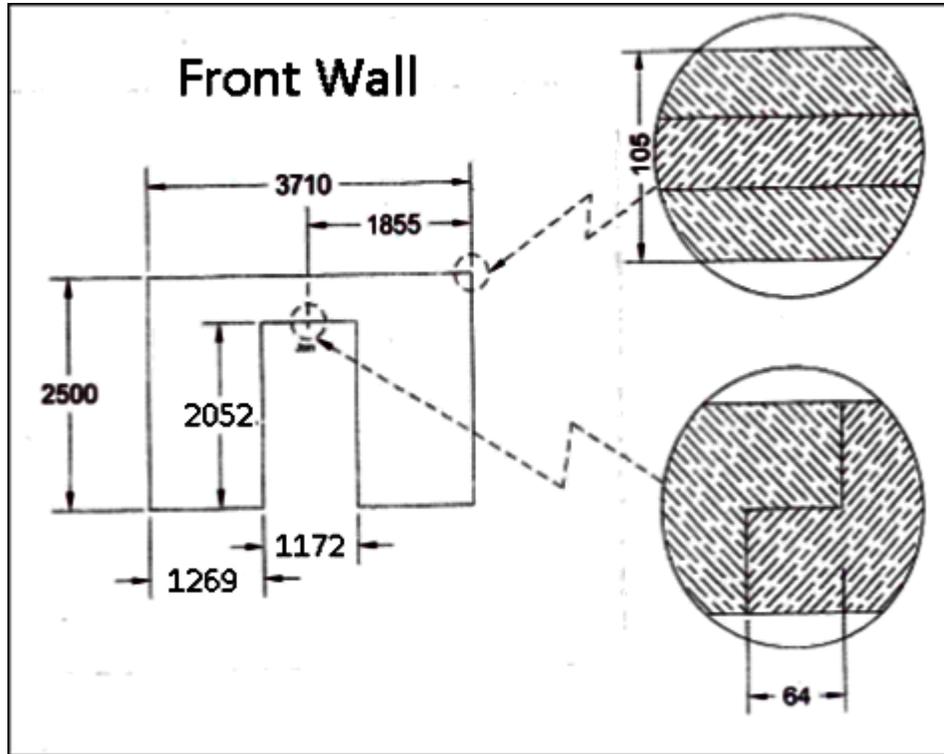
Dimensions in millimetres of front panels including the door opening
